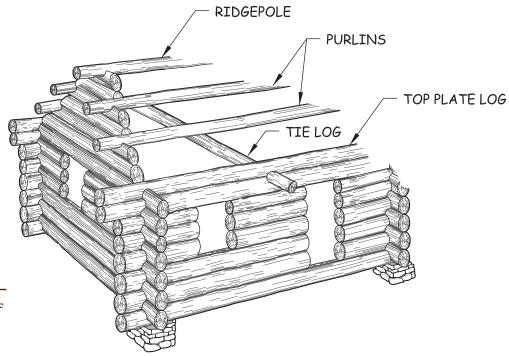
This drawing shows the structural framing of a purlin roof system. 140
